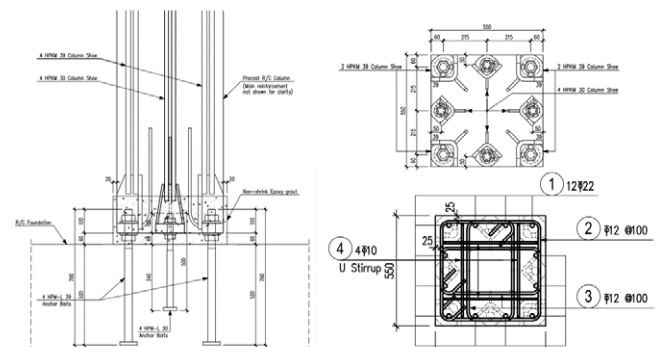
TYPICAL DETAILS OF COLUMN TO FOUNDATION CONNECTION WITH COLUMN SHOES AND ANCHOR BOLTS
